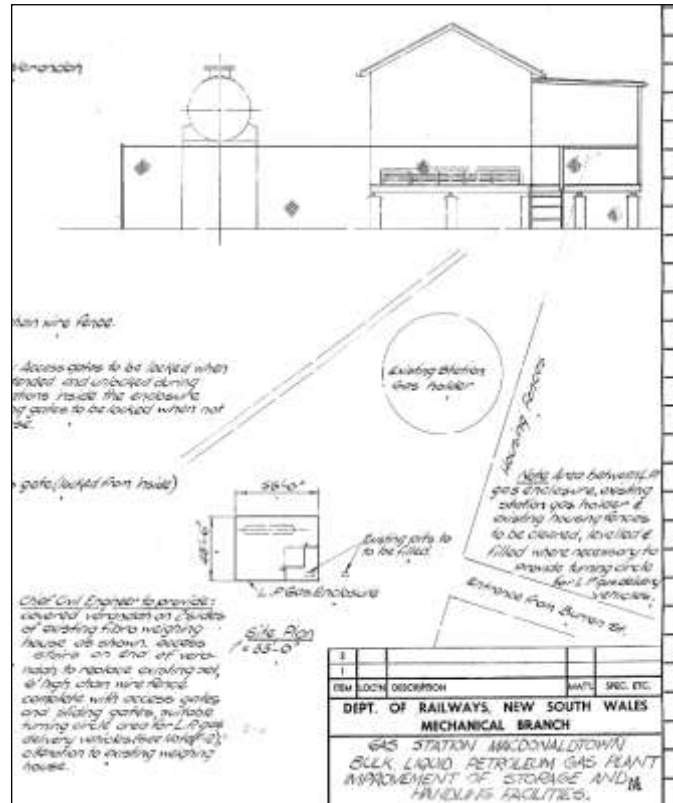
1965 Plan of the site shows only the northern Gasholder and an enclosure and fibro building for the weighing house. Note the tar wells were to be filled at this time and the area entered from Burren Street leveled.
